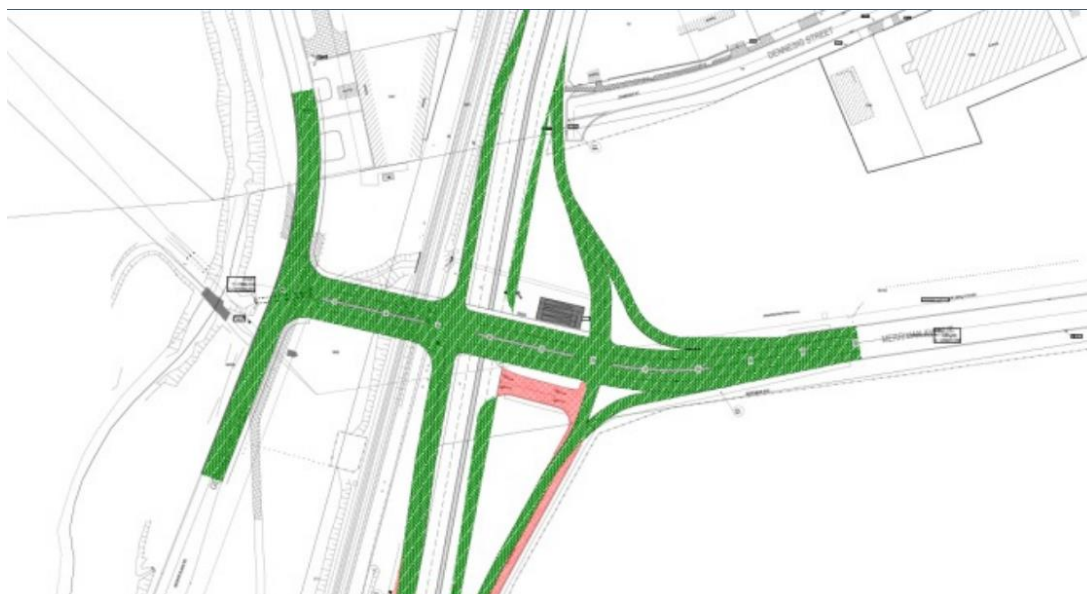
Planned upgrade of R44/Merriman Street intersection
